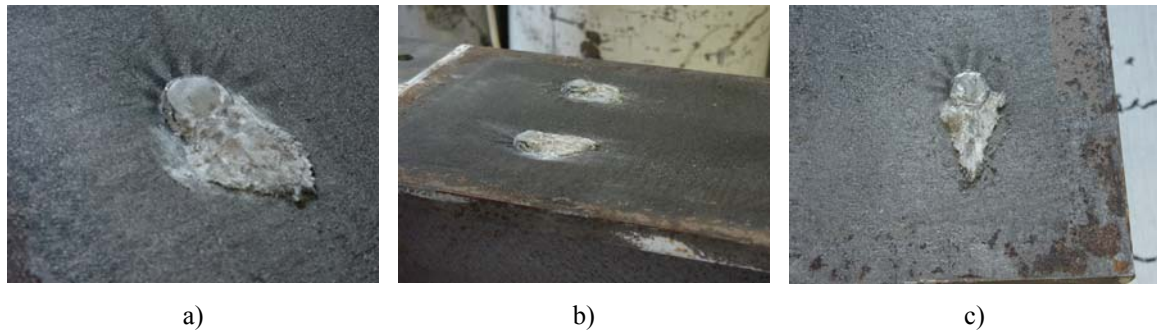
Monotonic loading: failure pattern on the stud shank (CN 13.1)
